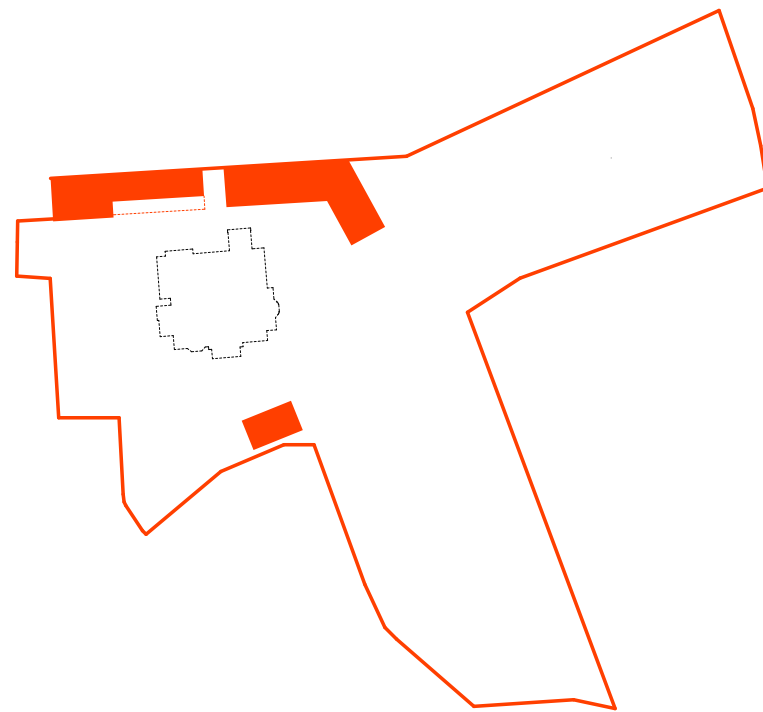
Site Diagram Depicting Site Boundary & Proposed Out Buildings
